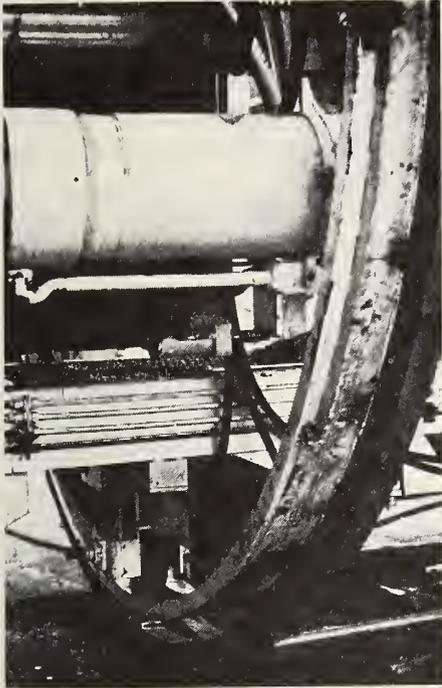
Ring Sliding In Direction of Machine Axis and Pivoting Around It, For Assembly and Installation of Steel Support Segments
